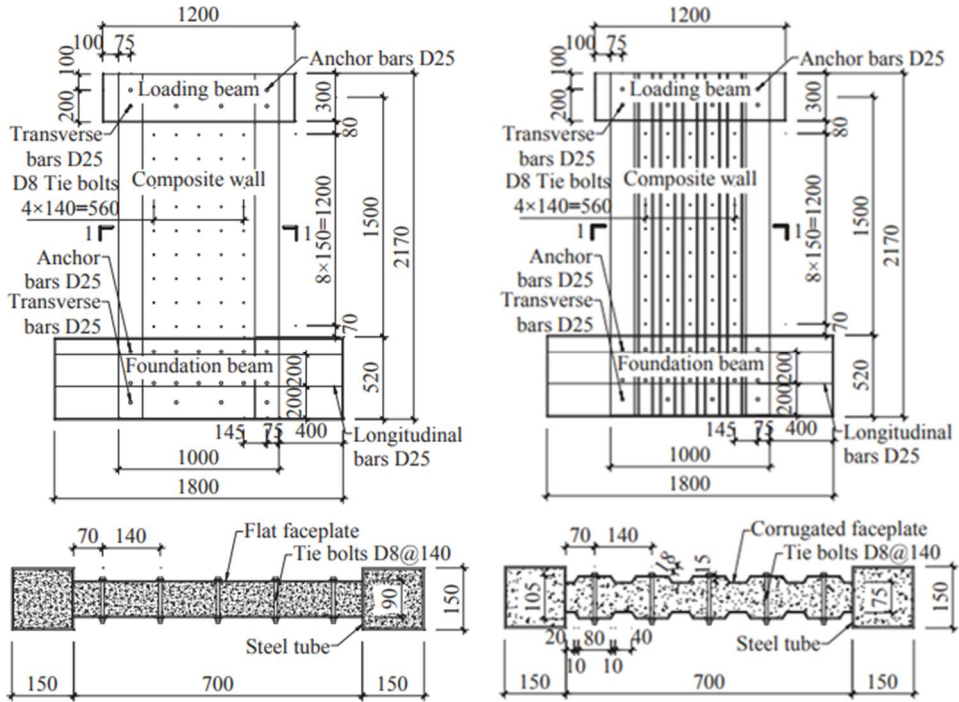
CFSP wall specimens with flat faceplates and corrugated faceplates
